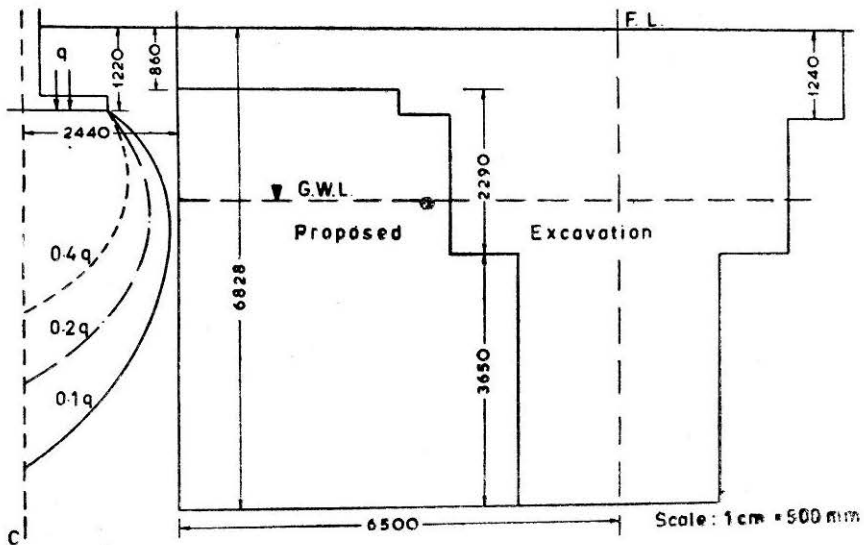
b Cross section close to boundary of R.C.C. column P_1 and stress distribution.
